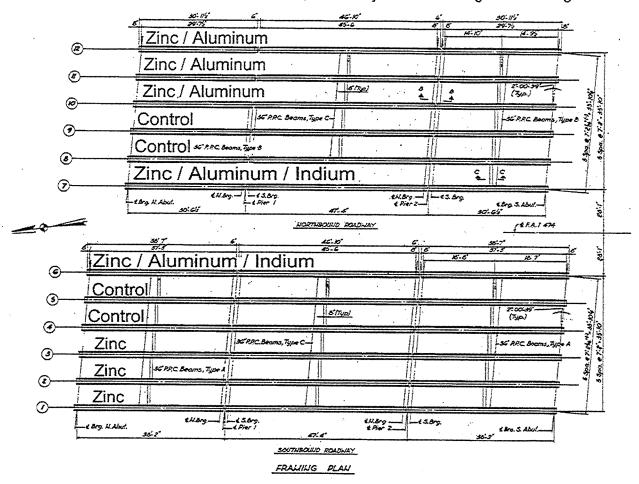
Framing Plan of twin structures. Note description of anode applied to north end of beams.
